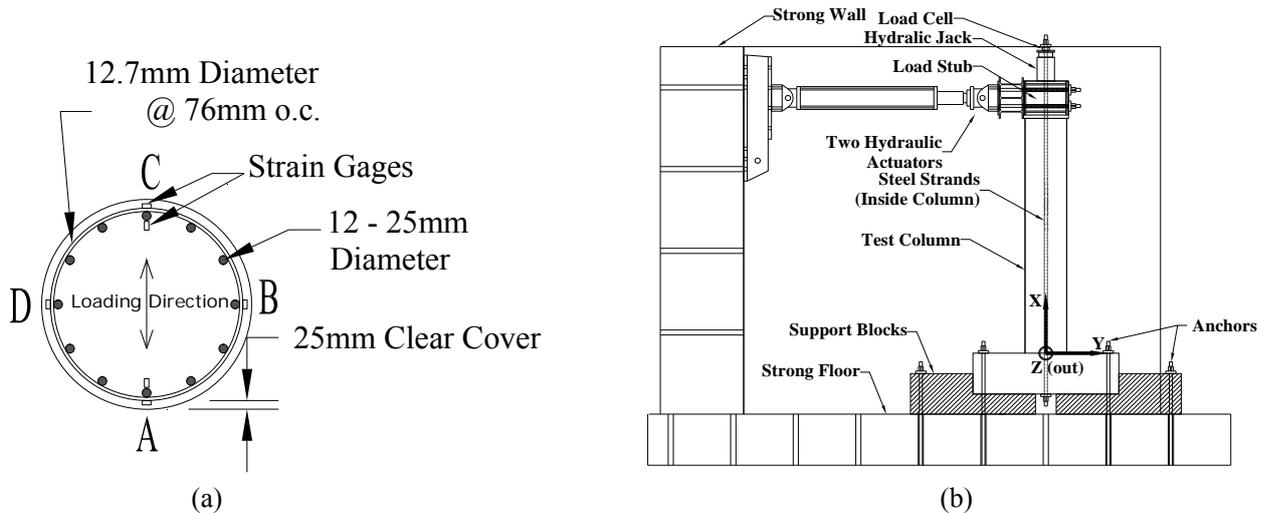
(a) Column cross sectional detail and (b) test setup elevation
